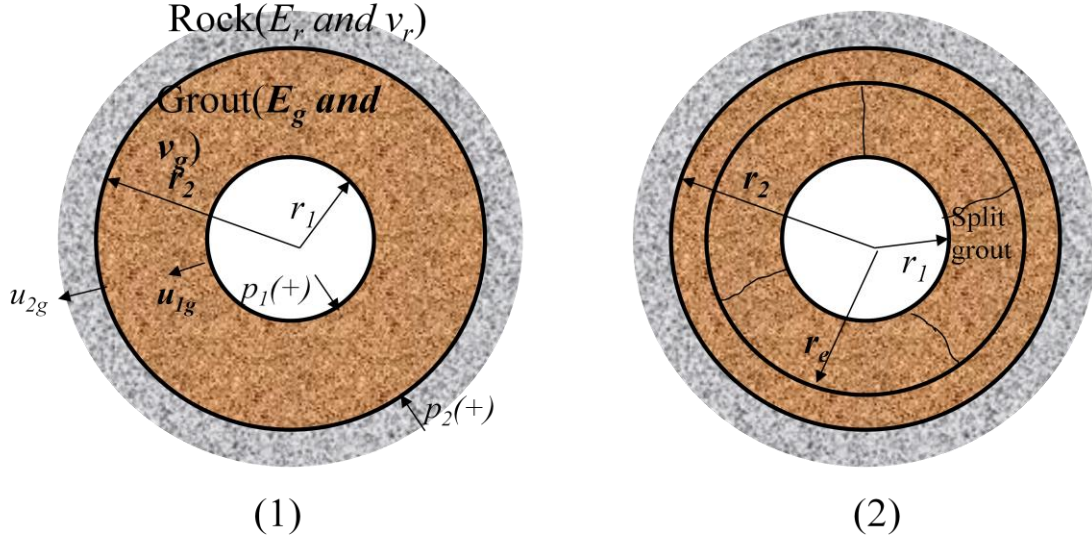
(1) Cross-section of a grouted bolt. (2) Conceptual cross-section of a fully-split grout column, modified from Yazici and Kaiser (1992).
